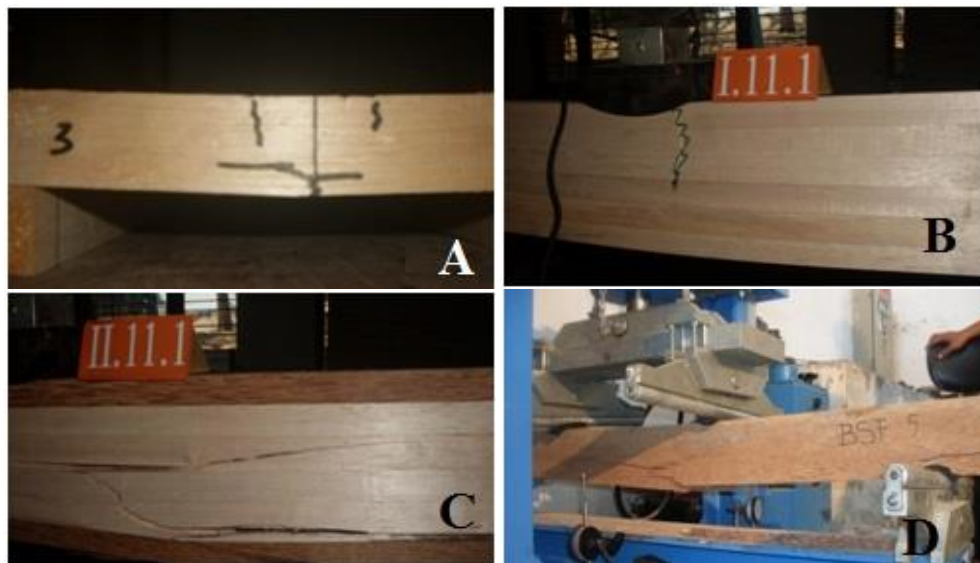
Failure Mode of Solid and Glue Laminated Timber Beams
